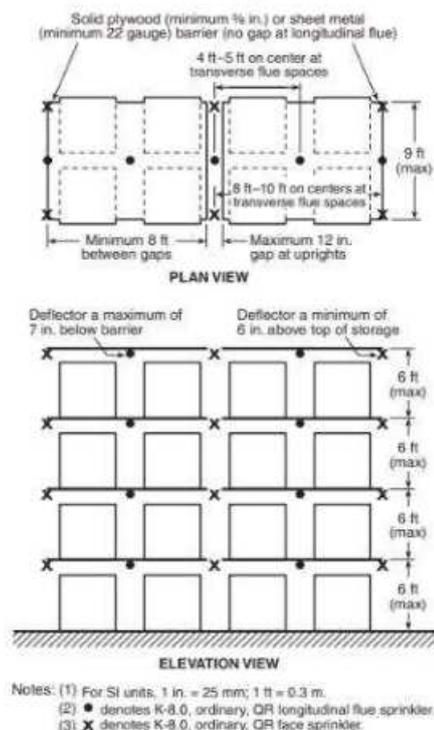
(a) Single-Row Rack Sprinkler Layout for Design Scheme "B" — Sprinklers in Center of Rack.
